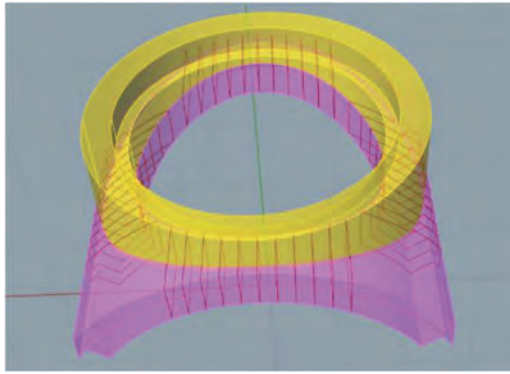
Geometry of permanent works for tunnel connections at Keith Hay Park and Walmsley Park, showing cross sections of the structural element extracted from the model.
